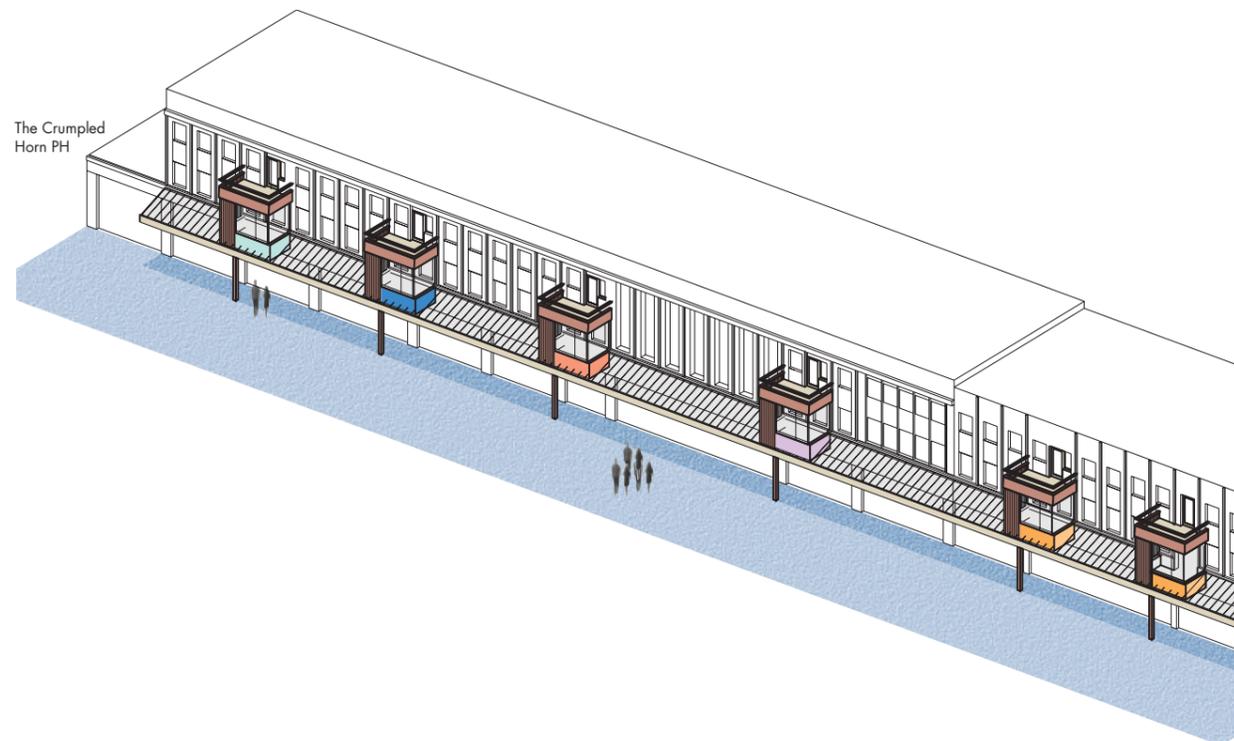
Tunbridge Wells Pantiles: street vista enlivened by build-outs over the arcade
